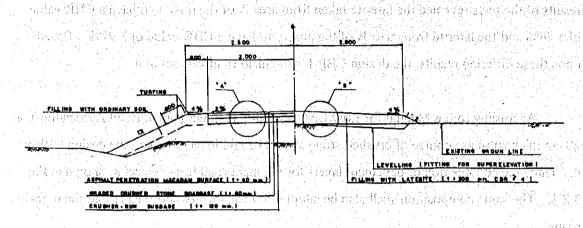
STANDARD CROSS SECTION OF BRANCH ROADS
